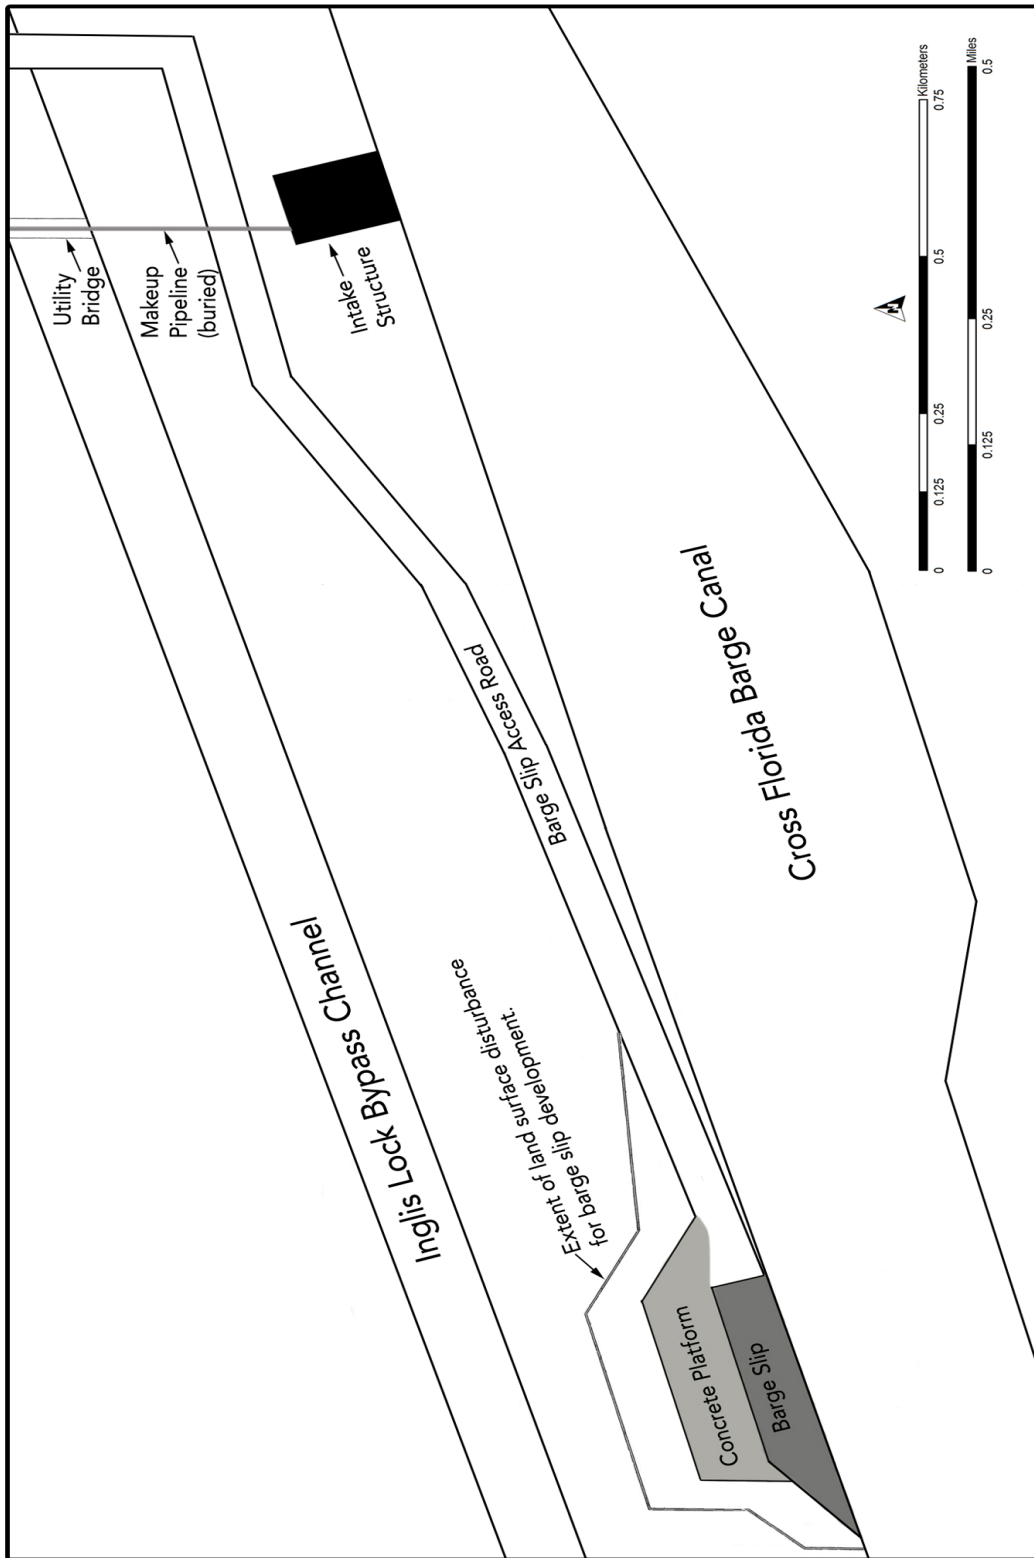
Proposed Cooling-Water-Intake Structure and Barge Unloading Facility Layout (PEF 2008c)
